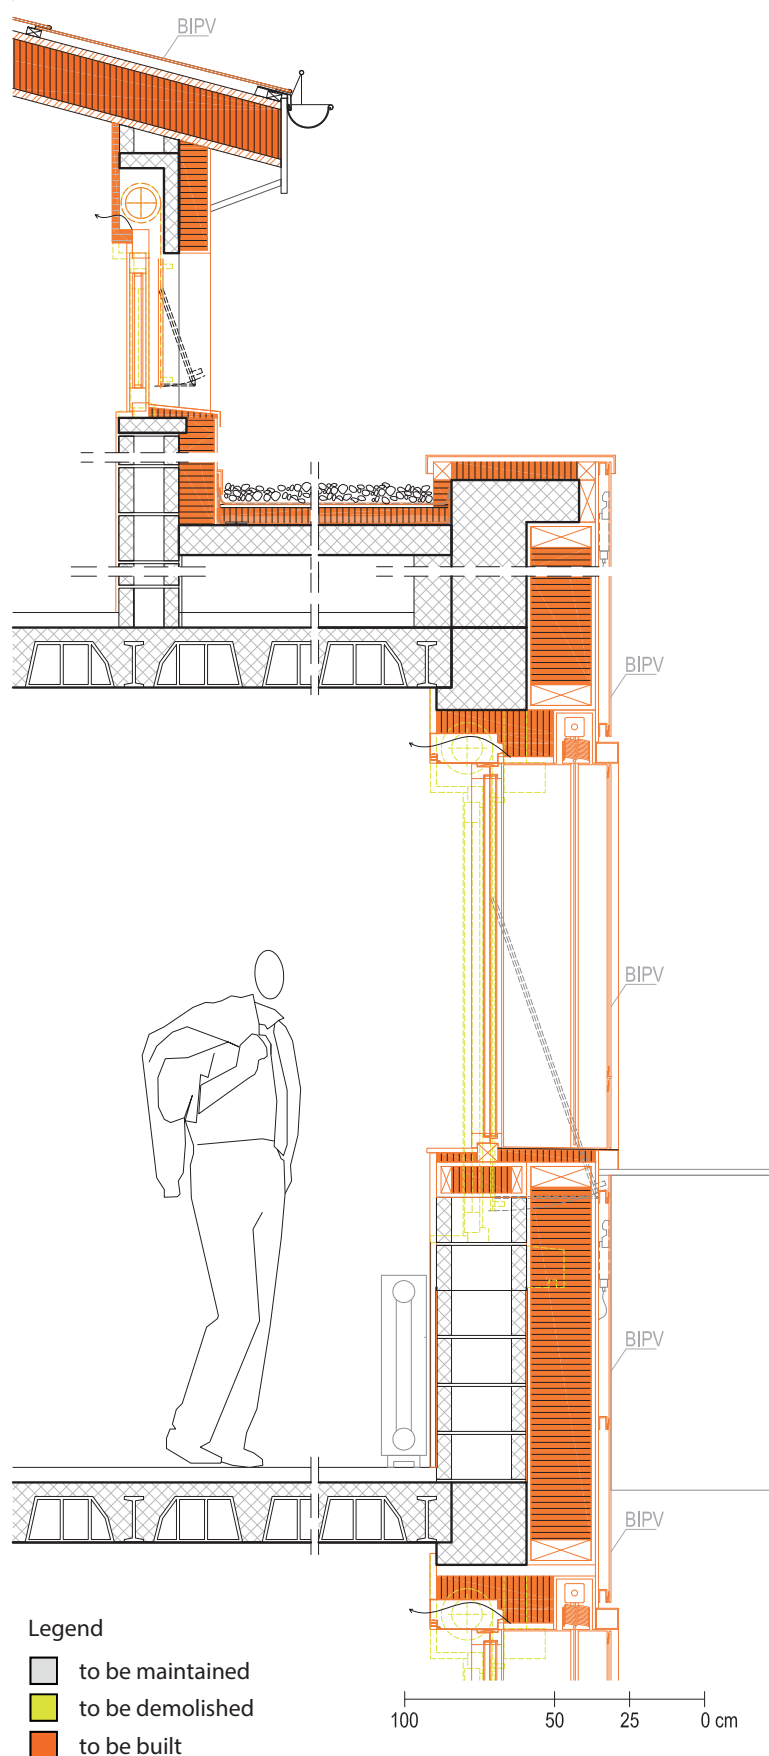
Façade constructive detail, S3 – BIPV Transformation, Archetype 2.
